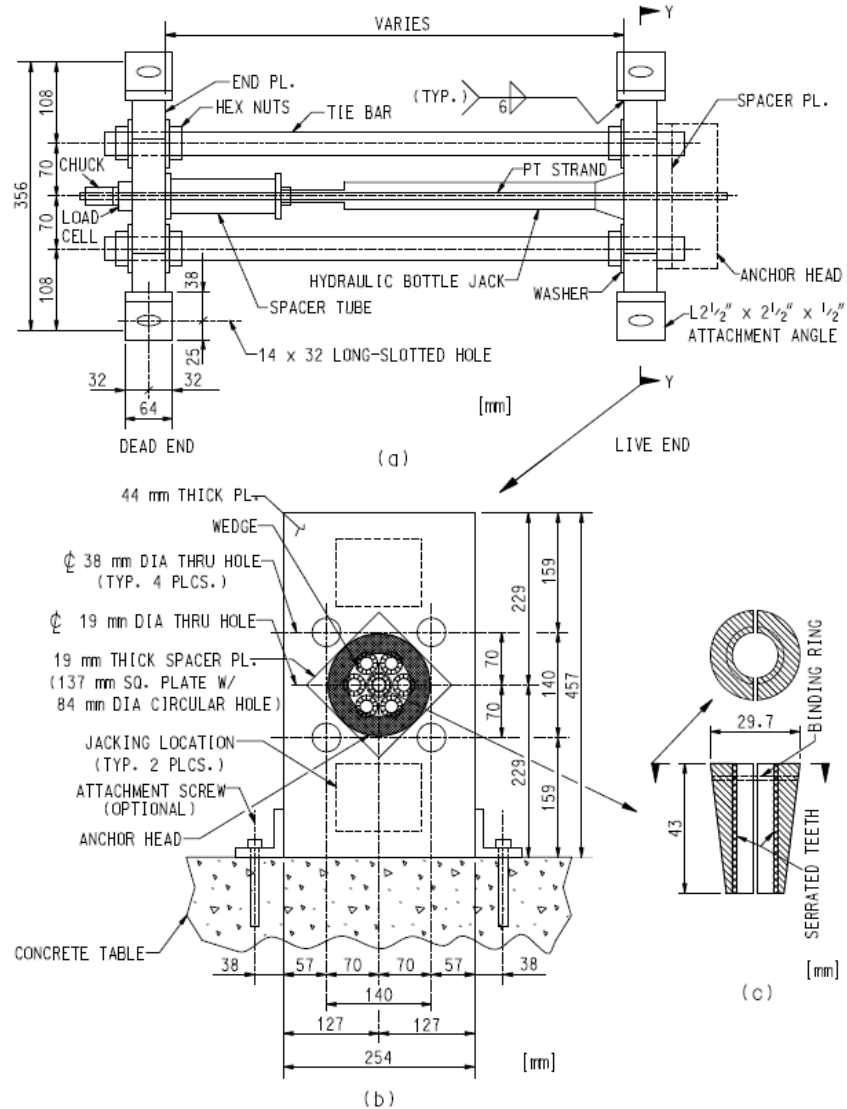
Details of stressing frame: (a) plan; (b) end plate elevation; (c) two-part wedge
